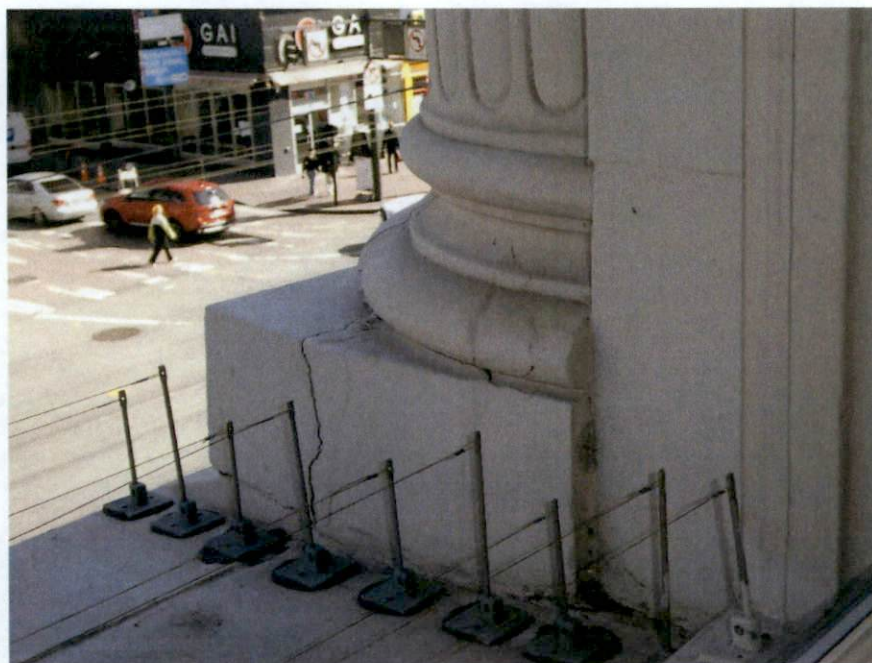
Photo G: Detail view of cracked spalling terra cotta seen at 3rd level window looking south from Market Street elevation.
